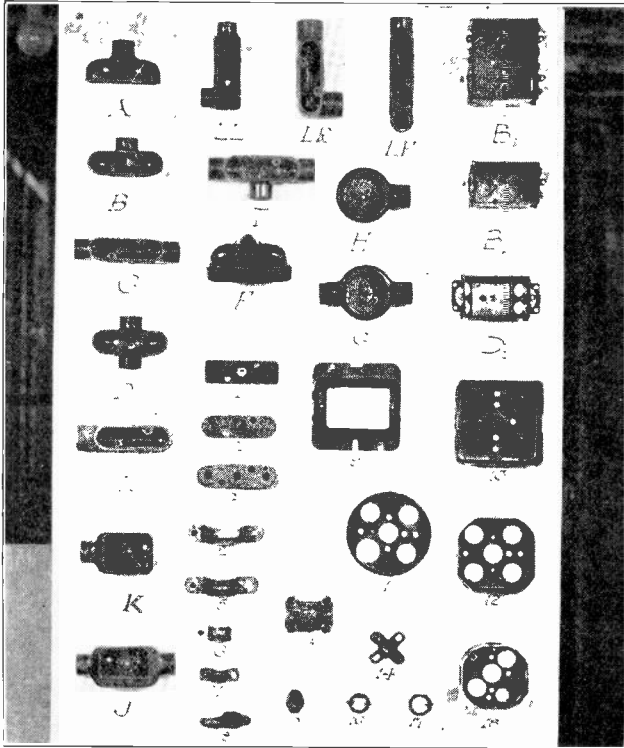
This photo shows a number of the more common types of conduit fittings and outlet boxes, also porcelain covers for the fittings, conduit straps, fixture stud and lock nuts.
